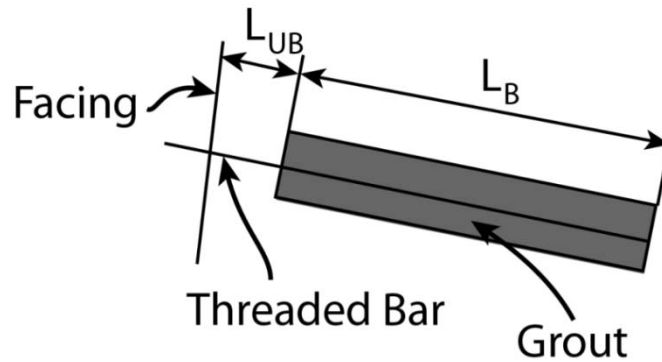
Layout of within soil structures of a soil nail during a verification test.
